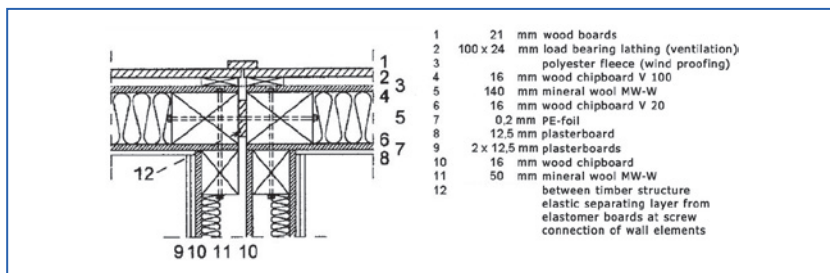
Connection between outer wall and wall separating flats (horizontal section) [[2] - (Austria)].
